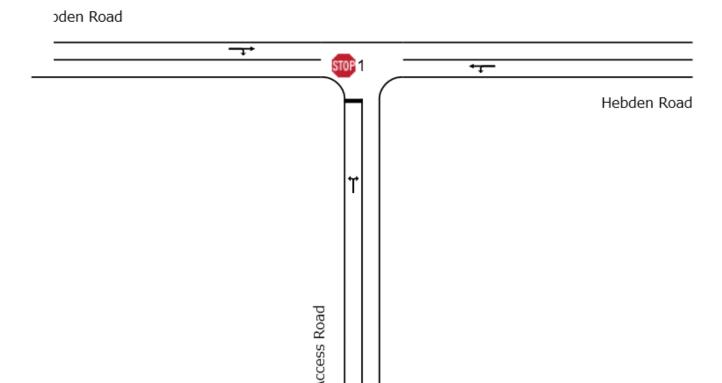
Hebden Road / Proposed Ancillary Pad North Access Road Intersection Layout
